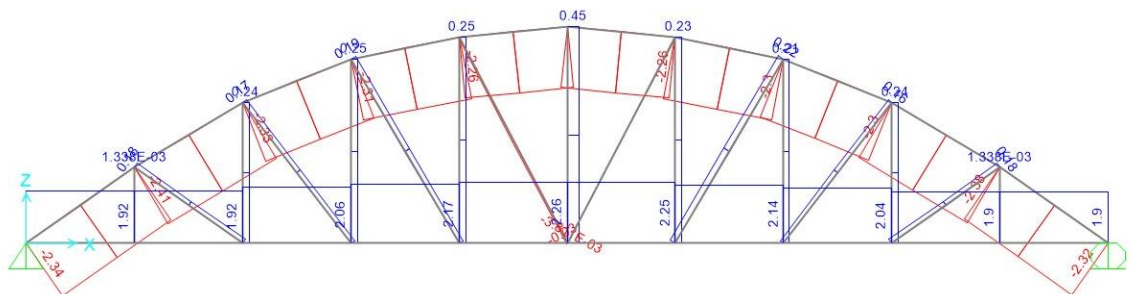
Axial force diagram of Truss B at experimental failure load of 5.04 kN
